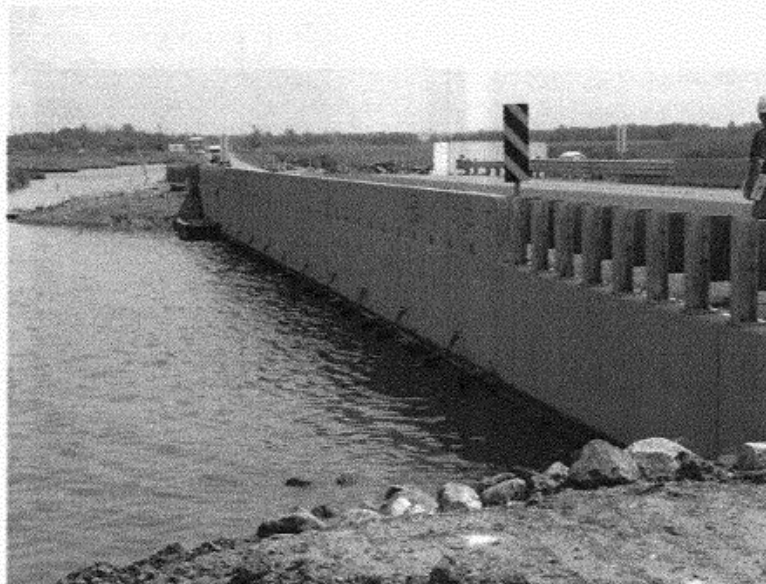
CS-29 Black Bayou Culverts - West Side/Outlet
